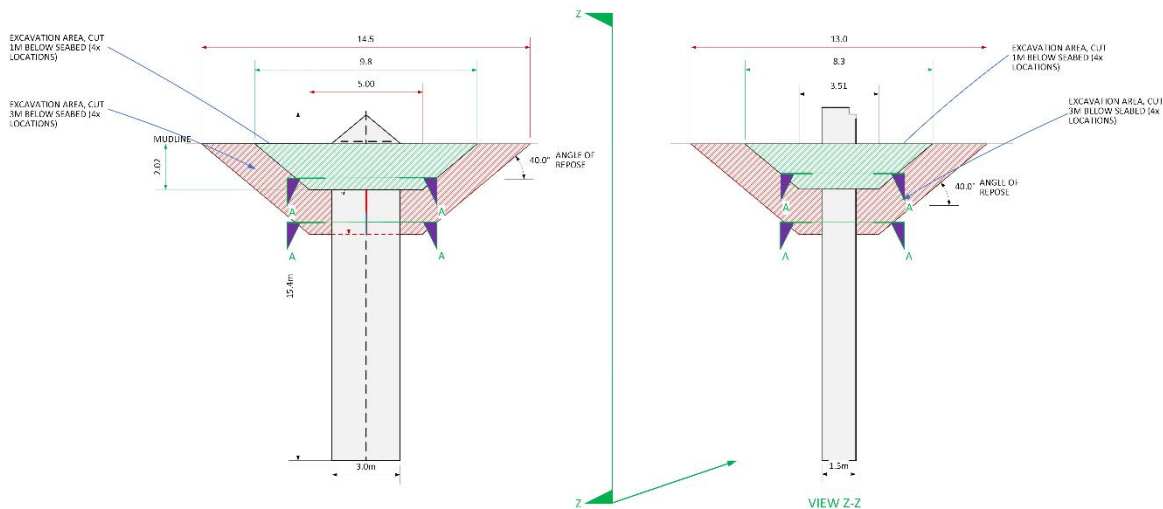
WHPS P1 indicative pile excavation requirements, sections (approx.)
